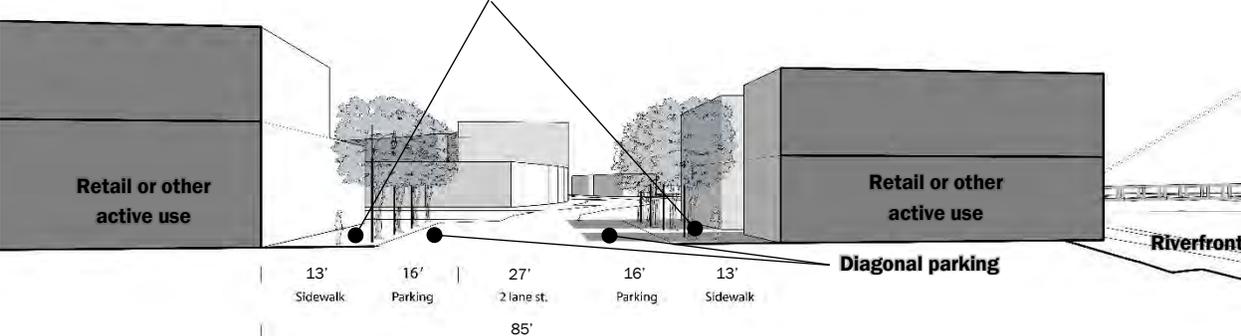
Proposed street section for McLean Boulevard at stadium, looking north.
